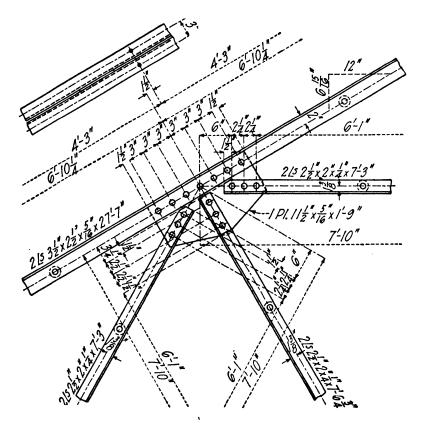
TRUSS JOINT, COMPLETELY DETAILED.
